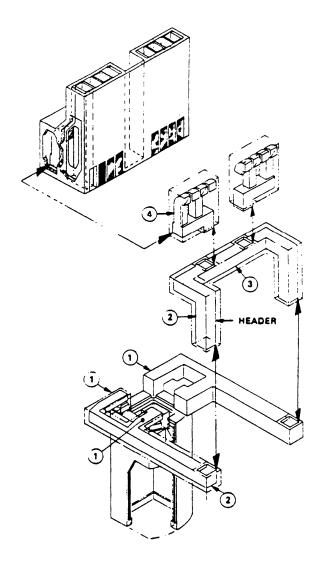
Inlet/Outlet Structure and Ductwork of the RCCS
